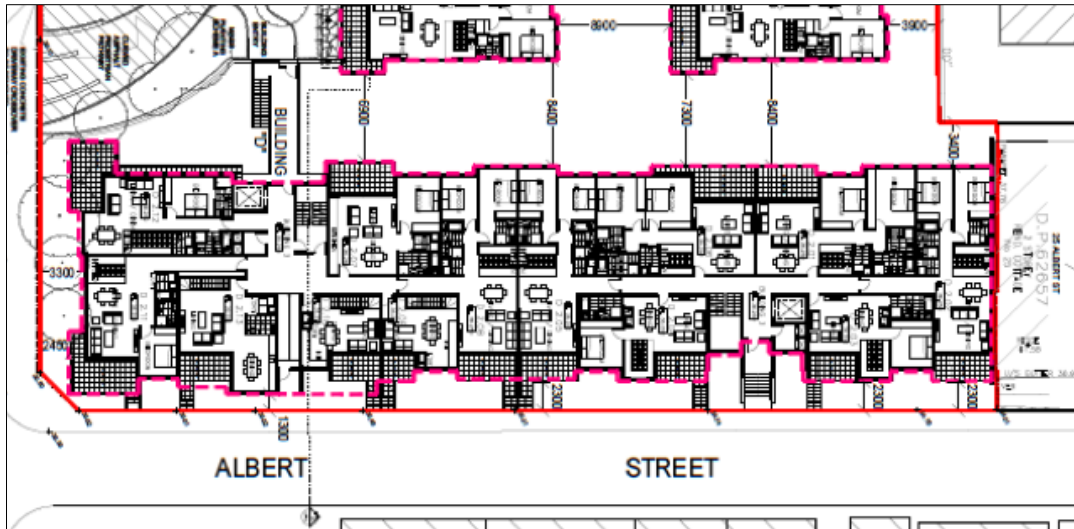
Detail of the accompanying plans showing the approved building line (in pink) and the proposed building line.
